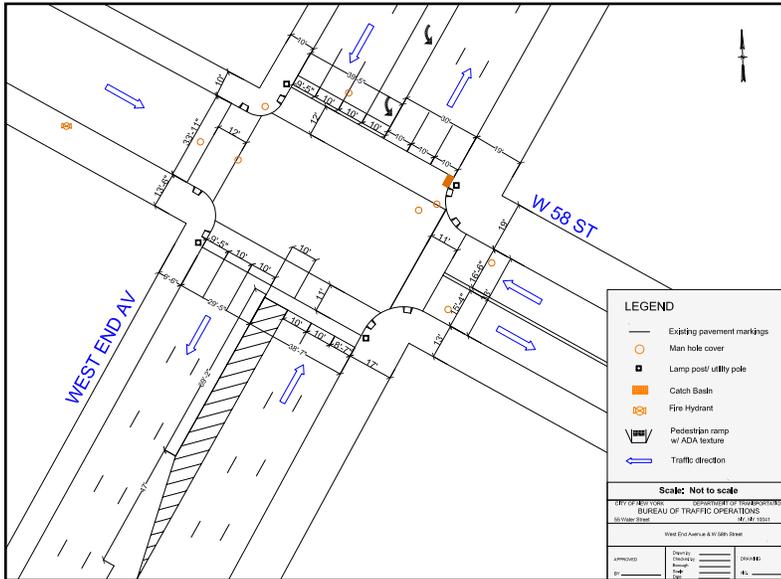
Existing Condition - West End Avenue & West 58th Street
